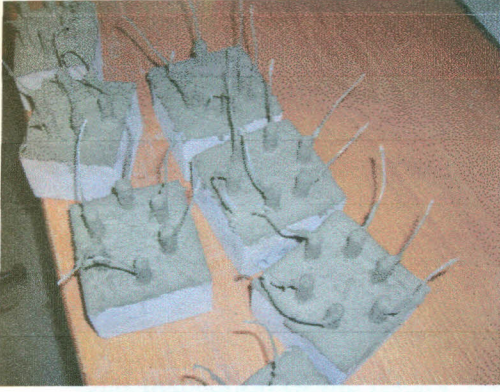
Steel reinforcement Protected Mortar Cubes
